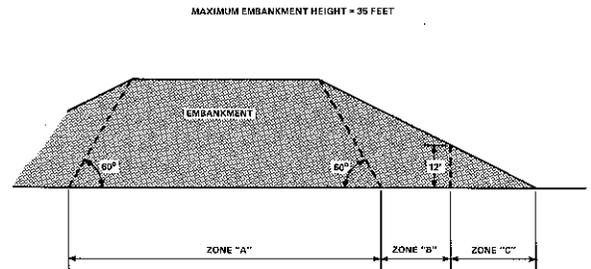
Typical Cross Section - Ramp Areas of Virginia Project
